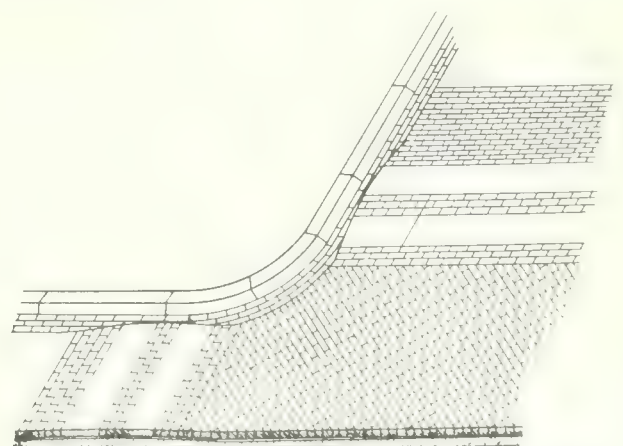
View Showing Setting of Bridge Stones at Street Corners.
